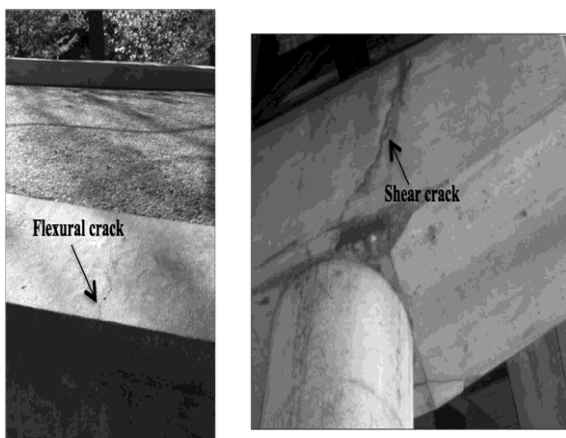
Left: a flexural (transverse) crack in concrete; right: a shear (slant) crack in a concrete beam [22]
